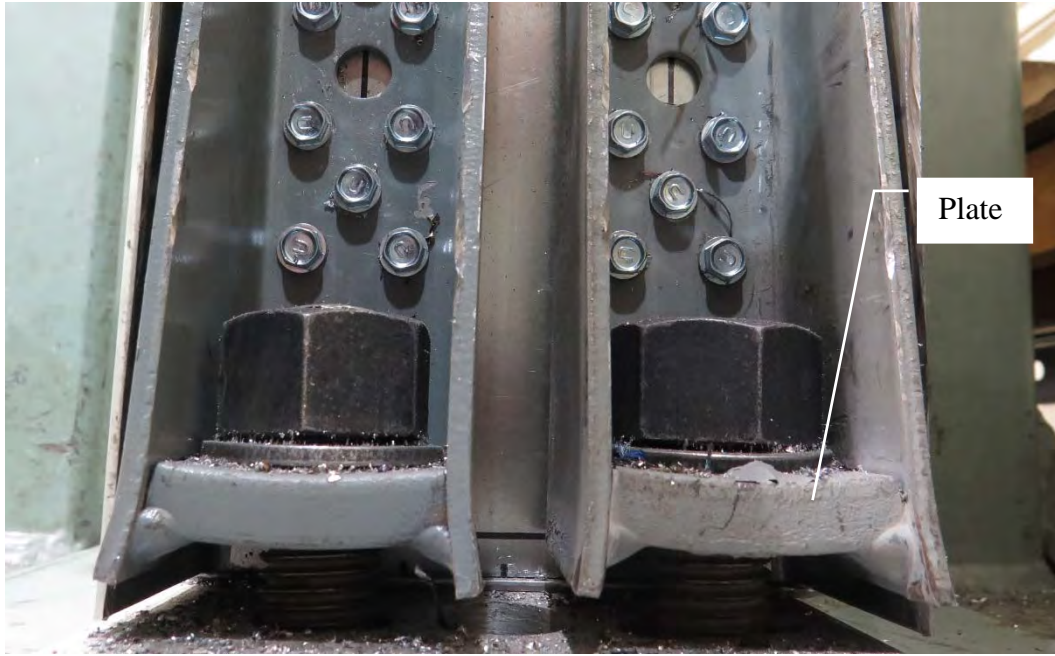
Damaged holdowns on the strongest specimens, using the highest degree of reinforcement (R3)
